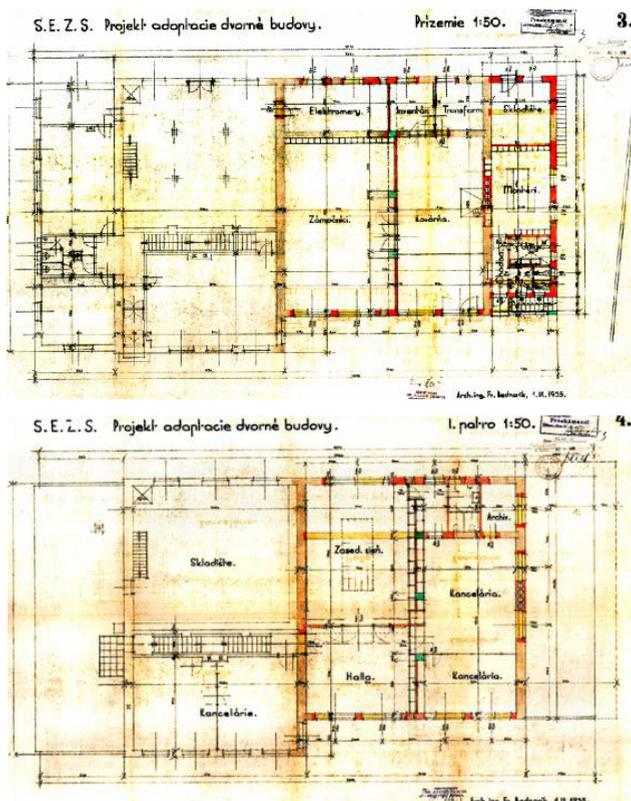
Adaptation plans. Left ground floor, right newly proposed 1st floor plan. Bednarik, 1935.
